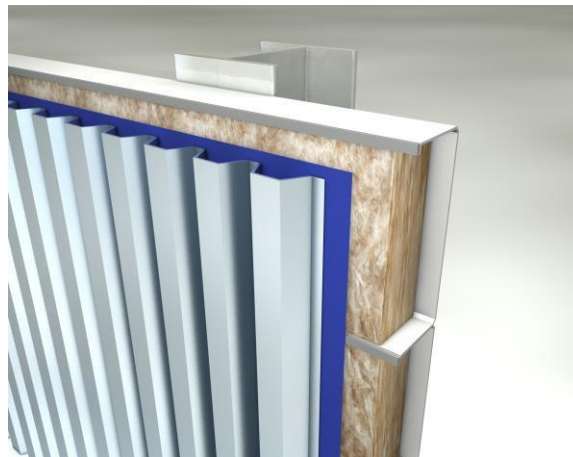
Built-up metal wall liner cassette tray system including an additional or secondary vapour check
